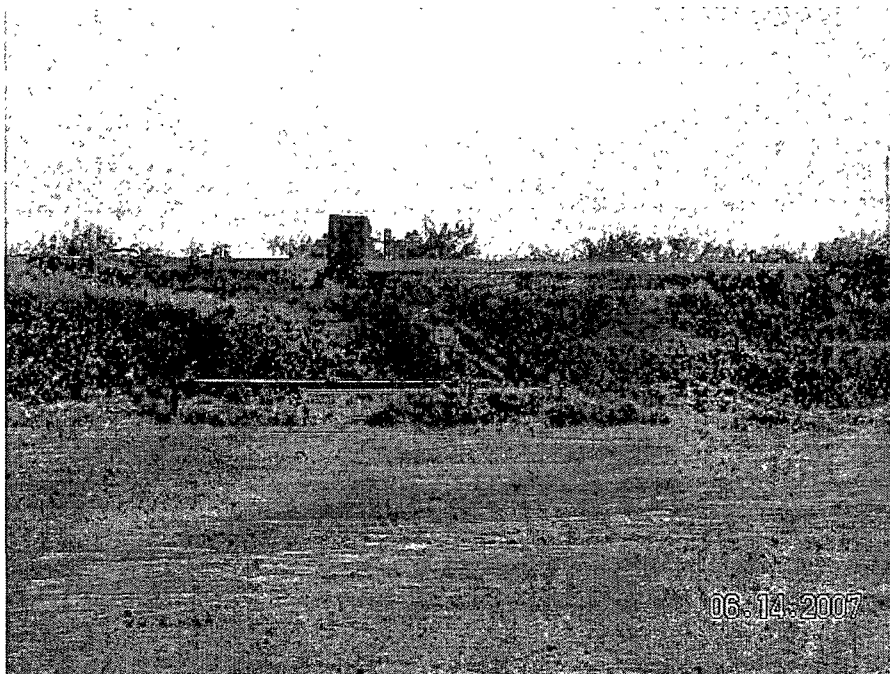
Looking westerly towards injection well excavation area after backfilling.
